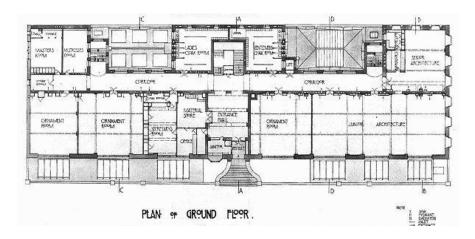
Ground floor plan, Glasgow School of Art. (GreatBuildings, n.d.)
